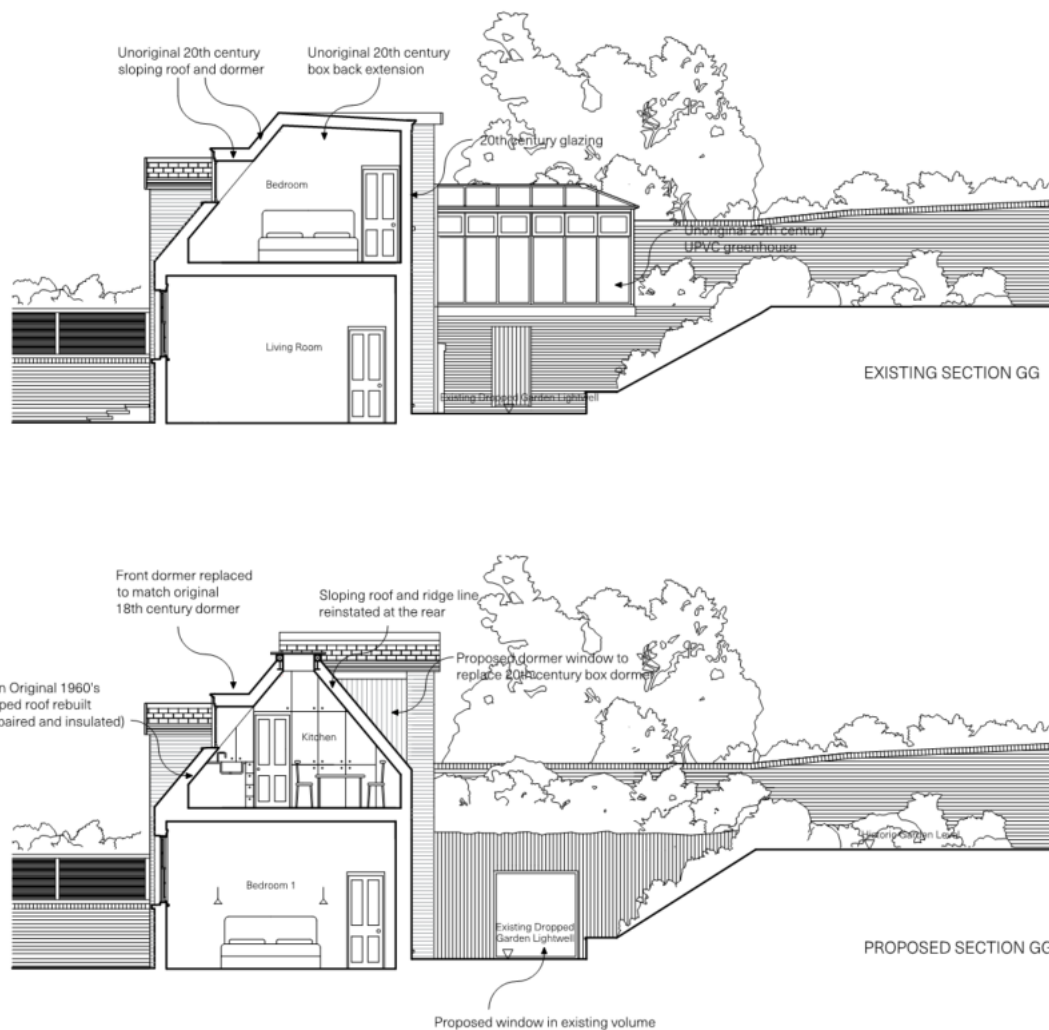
Proposed sections provided as part of applications 2021/3072/P & 2021/3075/L.
